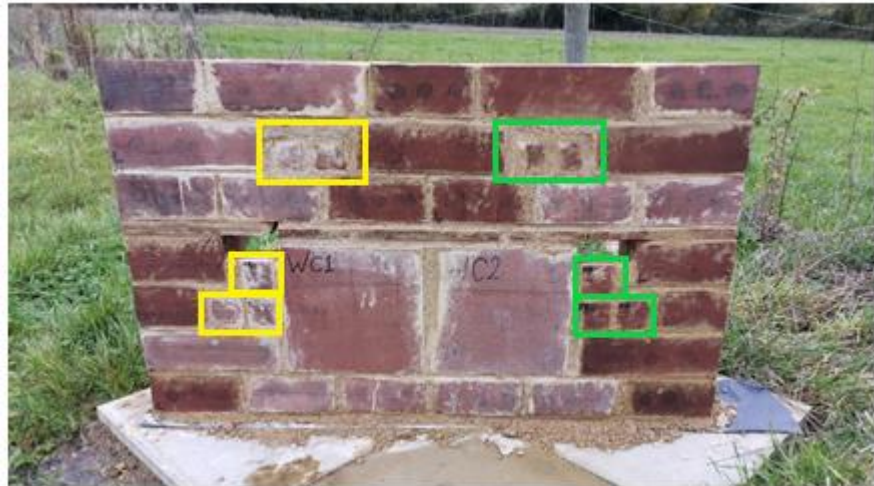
East Facing elevation of the test wall highlighting F Samples. Image © Author
